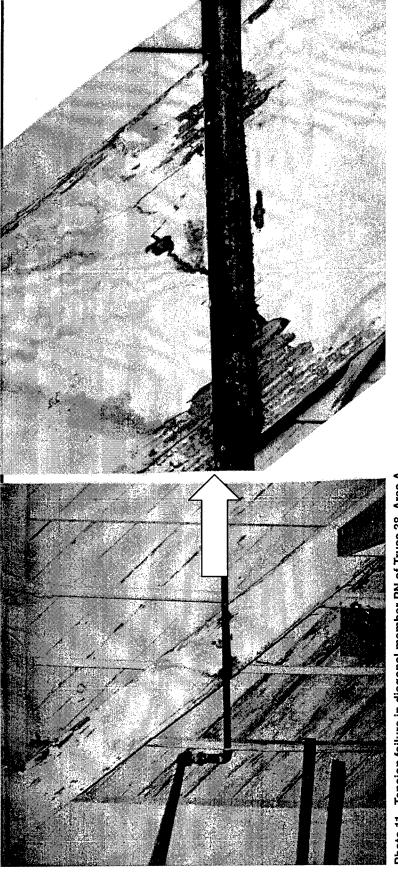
Tension failure in diagonal member PN of Truss 38, Area A.
